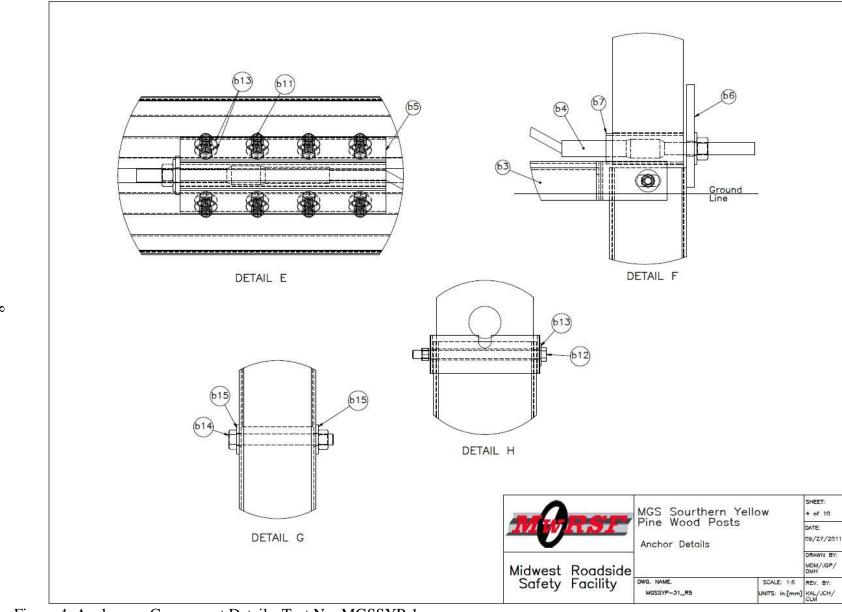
Anchorage Component Details, Test No. MGSSYP-1
